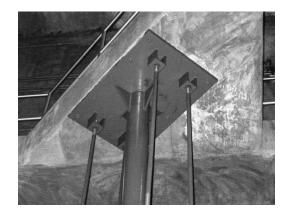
Pipe Hanger Assembly Attached to 4th floor Beam
